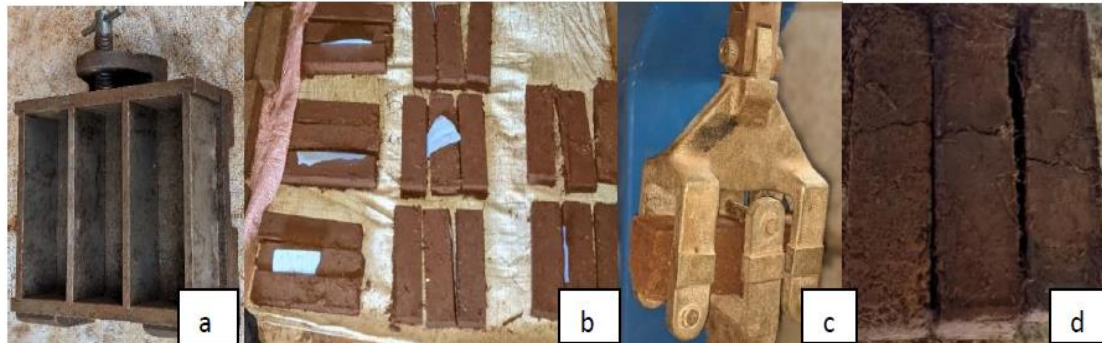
a) Flexural mould, b) Produced specimens (c) Three point flexural (d) Failed specimens.
